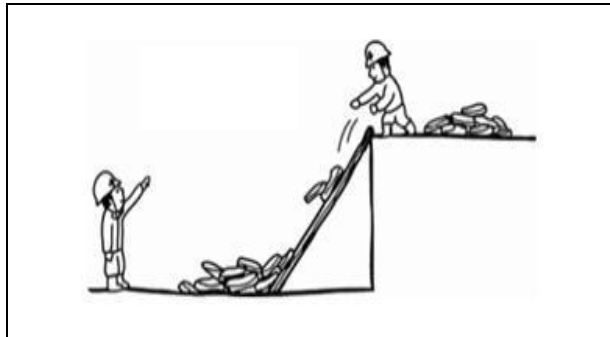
Flying and Falling Objects Prevention at the site close to existing road
